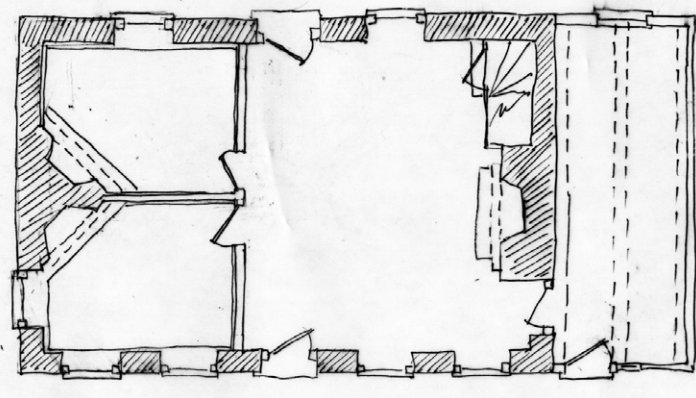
Reynolds-Van Syckel Tavern, first floor plan, no scale. Sketch by Carla Cielo.
